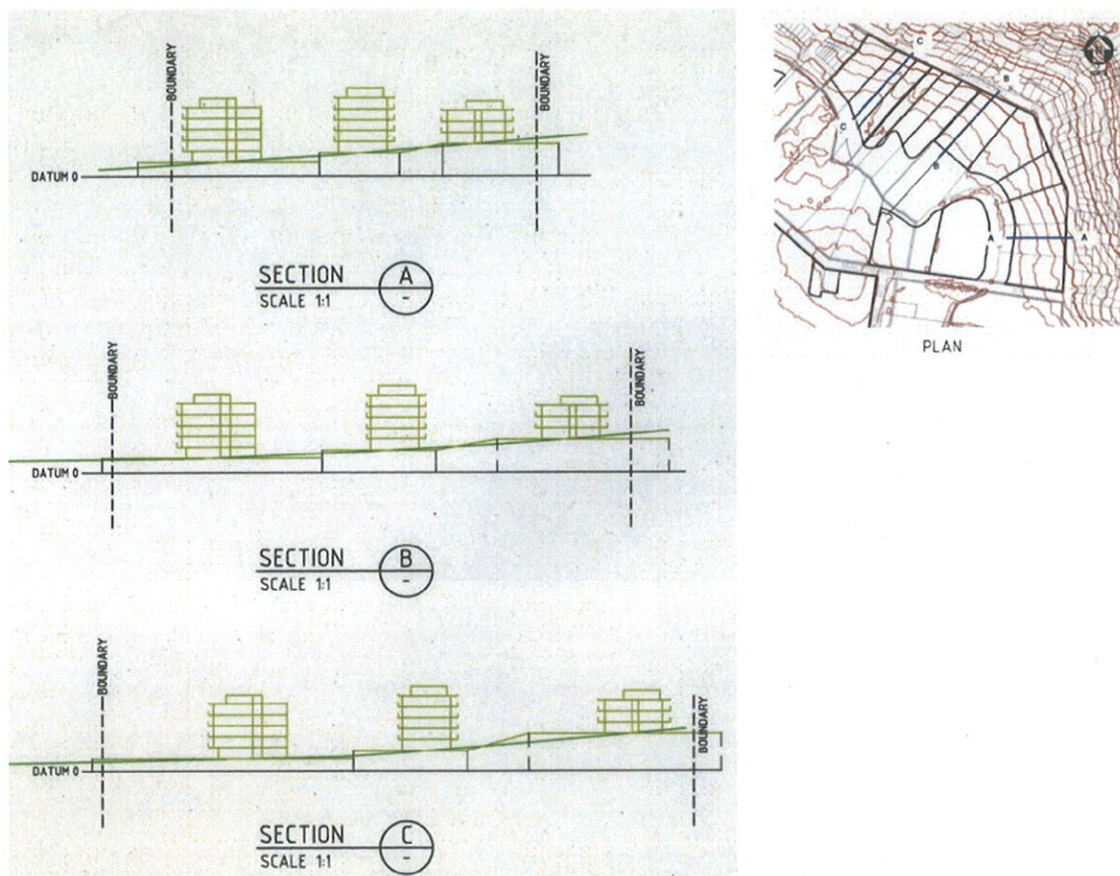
SECTIONS THROUGH BUFFER AREA 1 WITH EXAMPLE OF 3-5 STOREY BUILDINGS
